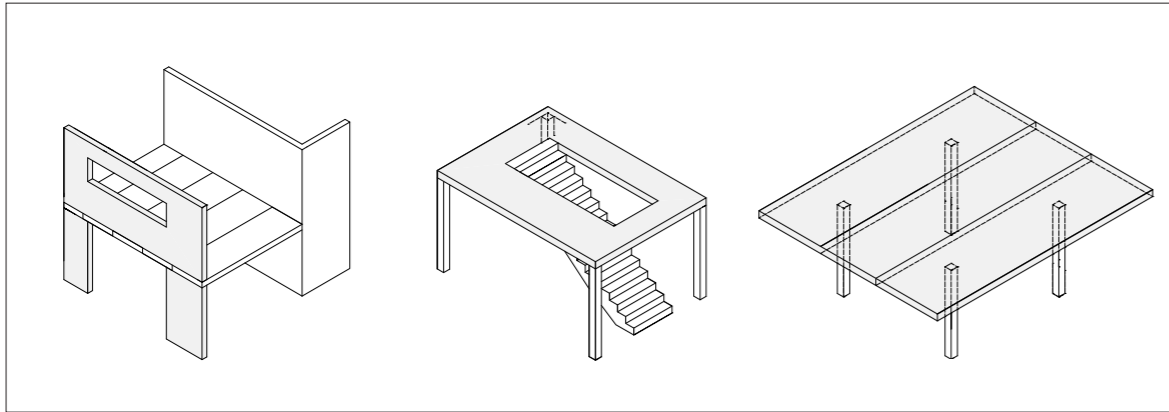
Deep-beam with openings (left), plate elements with opening and notches (middle), and segmentation and joints of DLT slabs (right)
